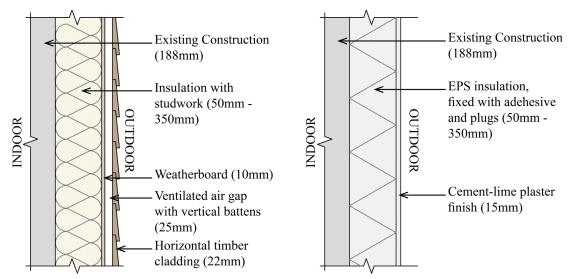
Facade construction details, where insulations with studwork are on the left, and EPS with no studwork is on the right
